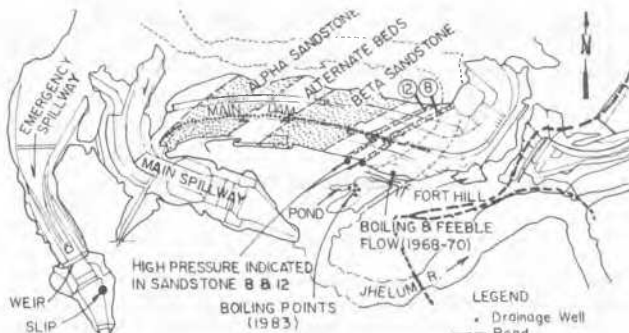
Layout Plan Mangla – Main Dam/Boiling Locations & Geology
